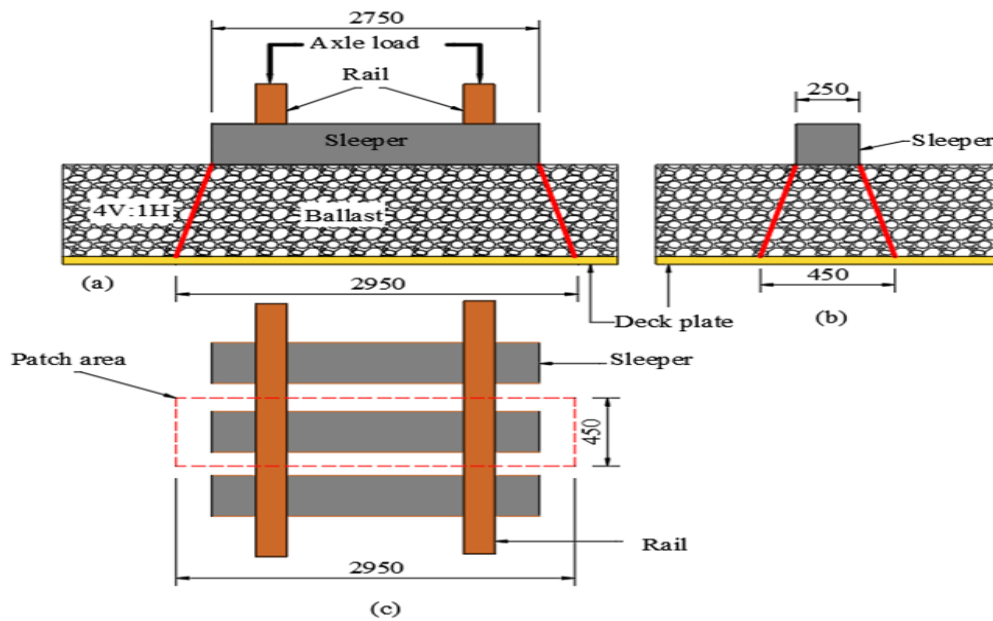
Load distribution through ballast (a) transverse section and (b) longitudinal section (c) top view
